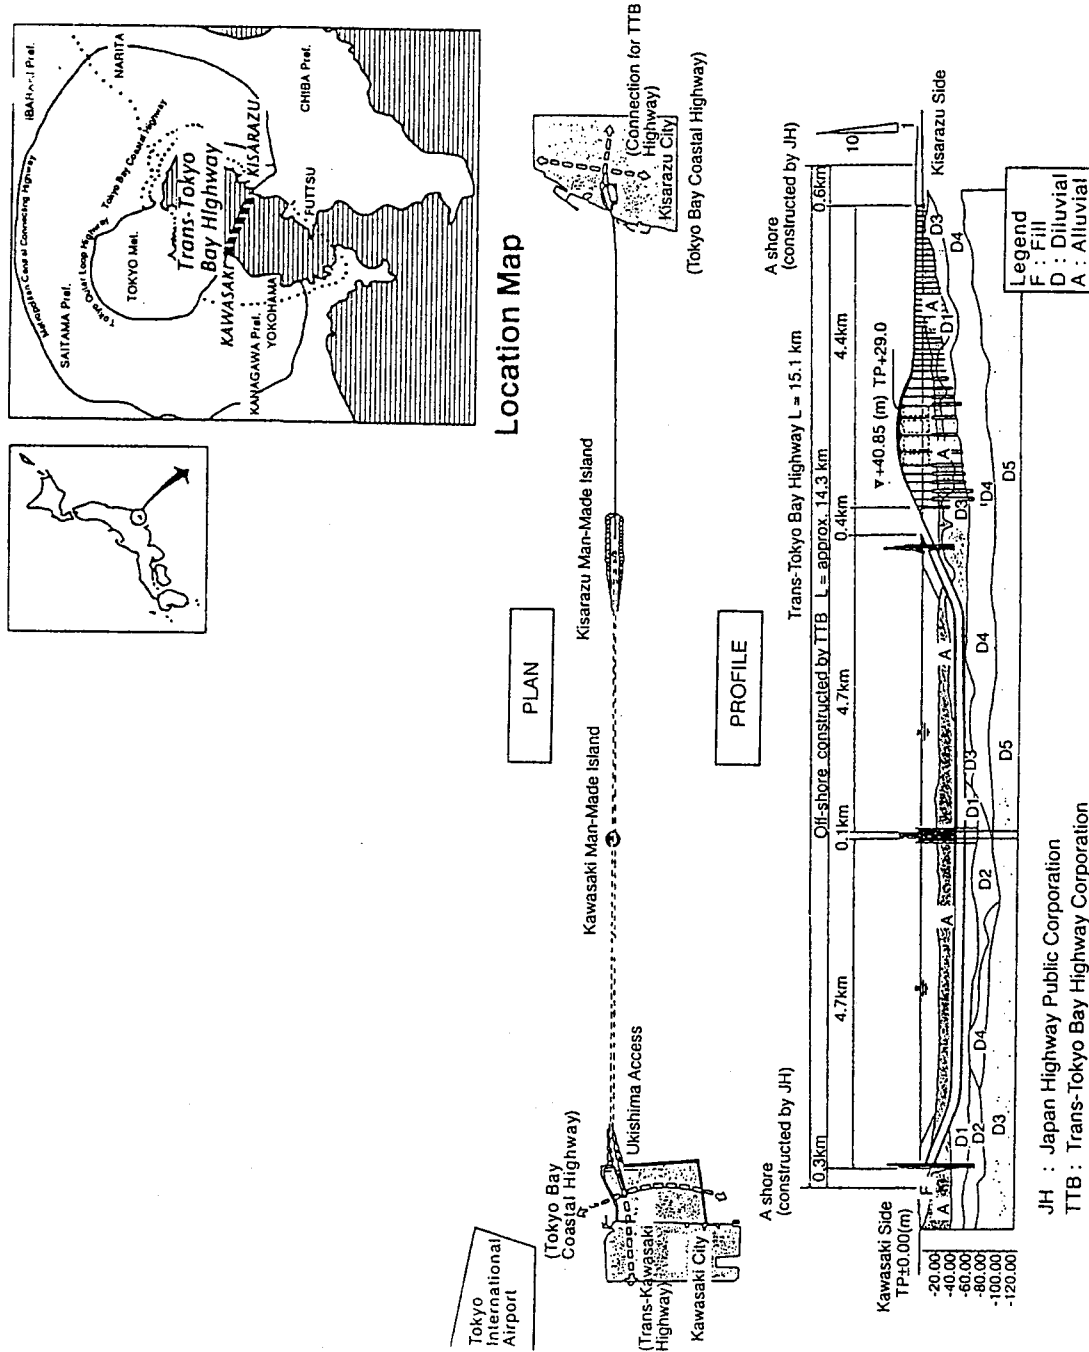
General plan of the Trans-Tokyo Bay Highway (Uchida et al., 1996).
